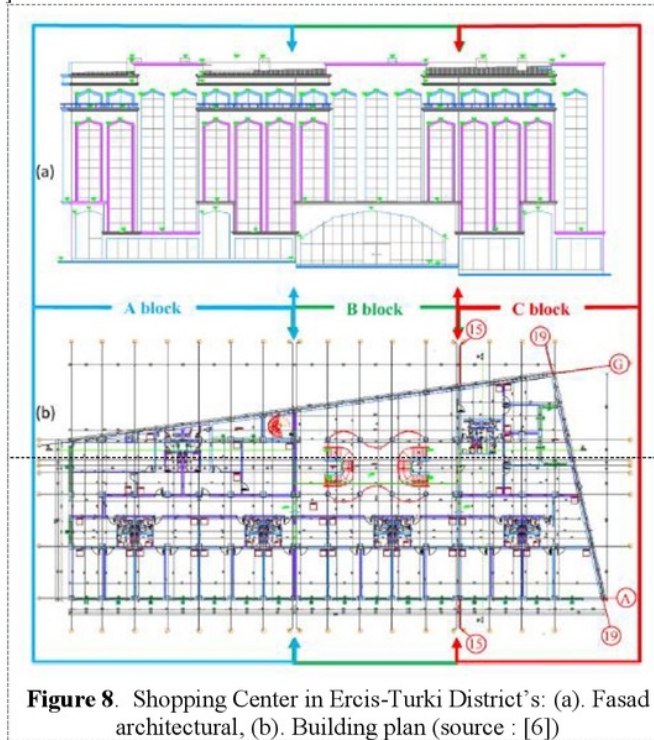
Shopping Center in Ercis-Turki District's: (a). Fasad architectural, (b). Building plan (source : [6])
